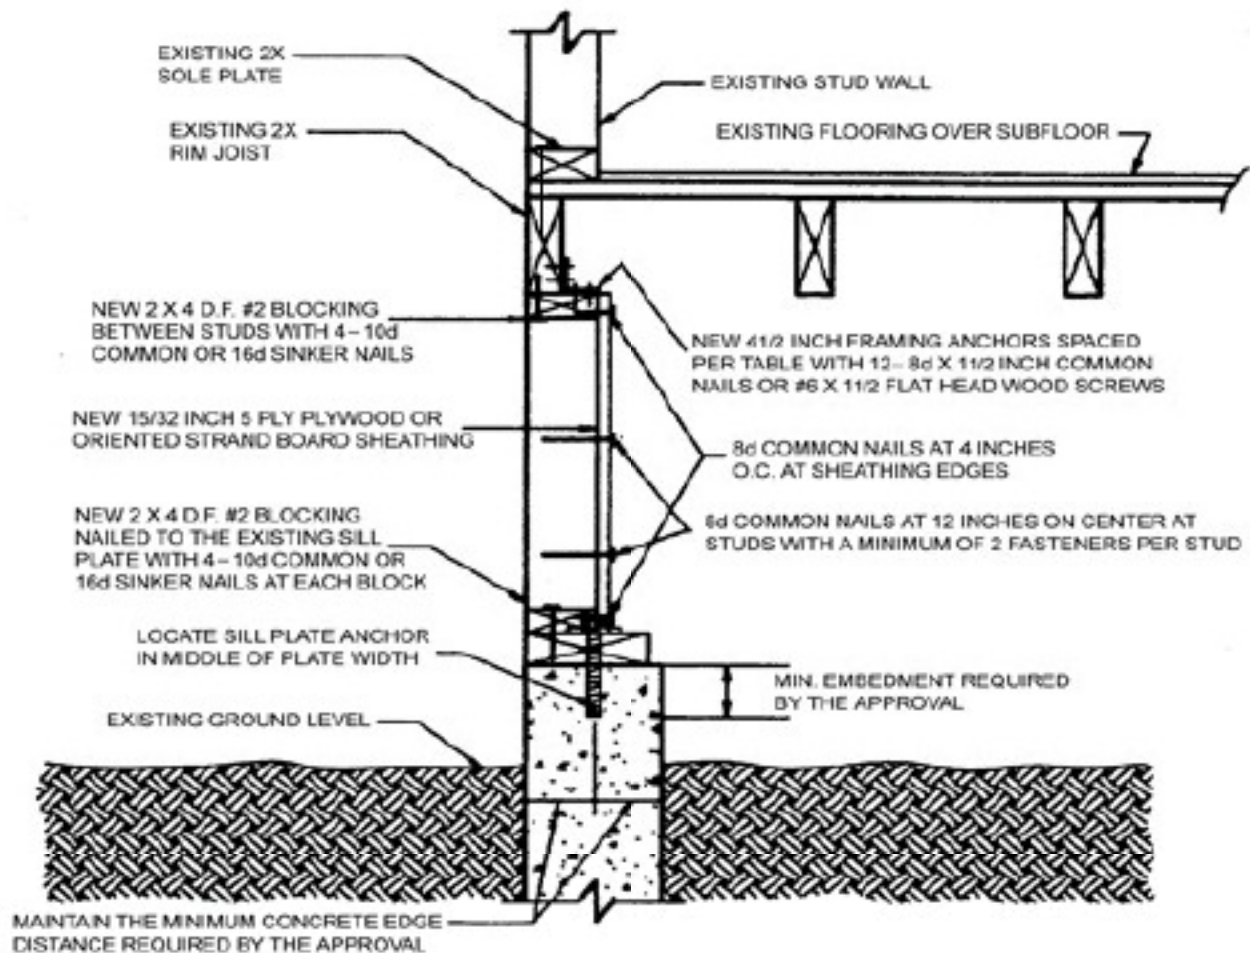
Detail from the Los Angeles Standard Retrofit Plan (See Chapter 6) of a connection between a wall and a horizontal floor diaphragm, with strengthening of the connection between the top of the cripple wall and the floor joist blocking above the wall (from ATC, 2002).
